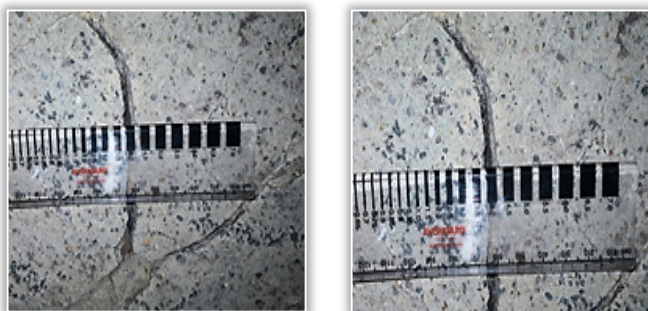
Cracking of reinforced concrete elements of fermentation tank
